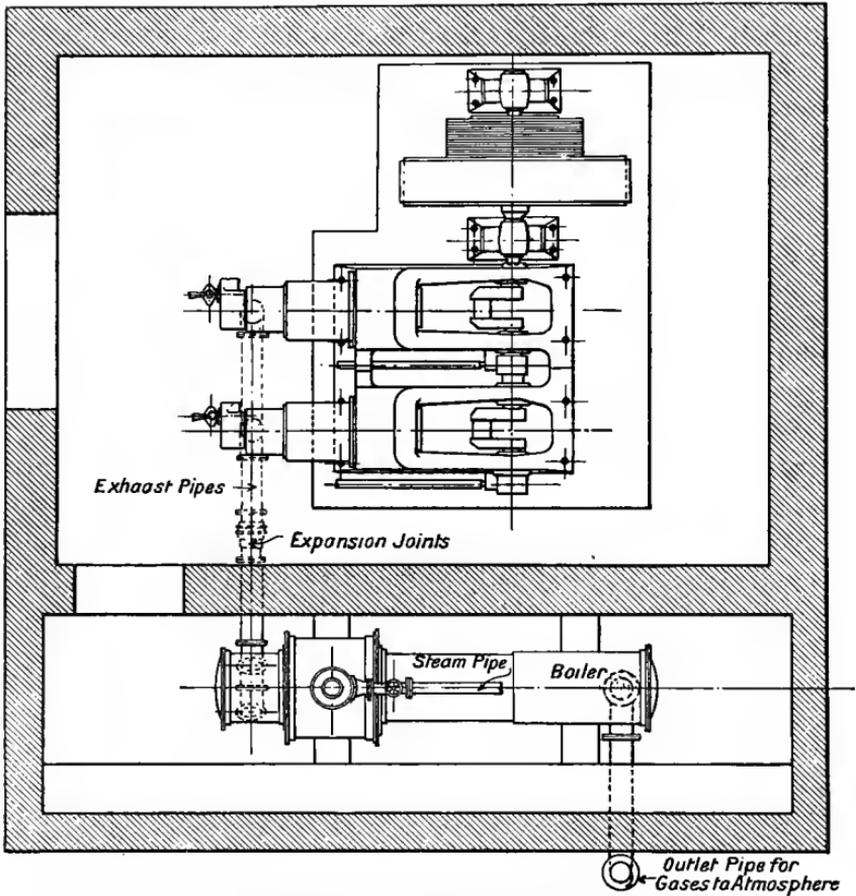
Diagram shewing the method of connecting an exhaust heat boiler to the engine.
